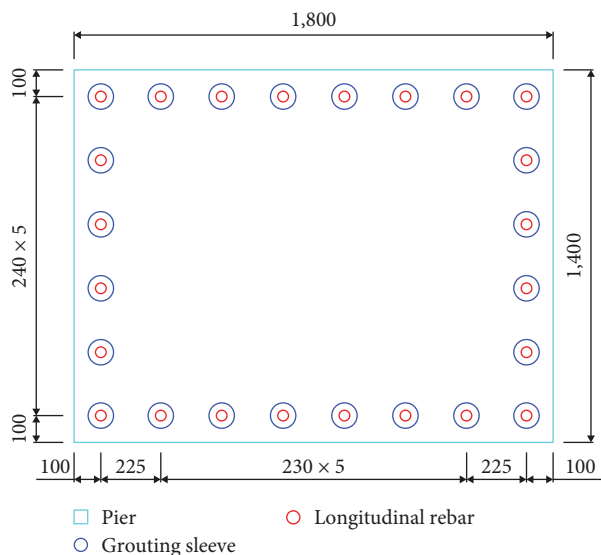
Detailed drawing of grouting sleeve arrangement form (unit: mm).
